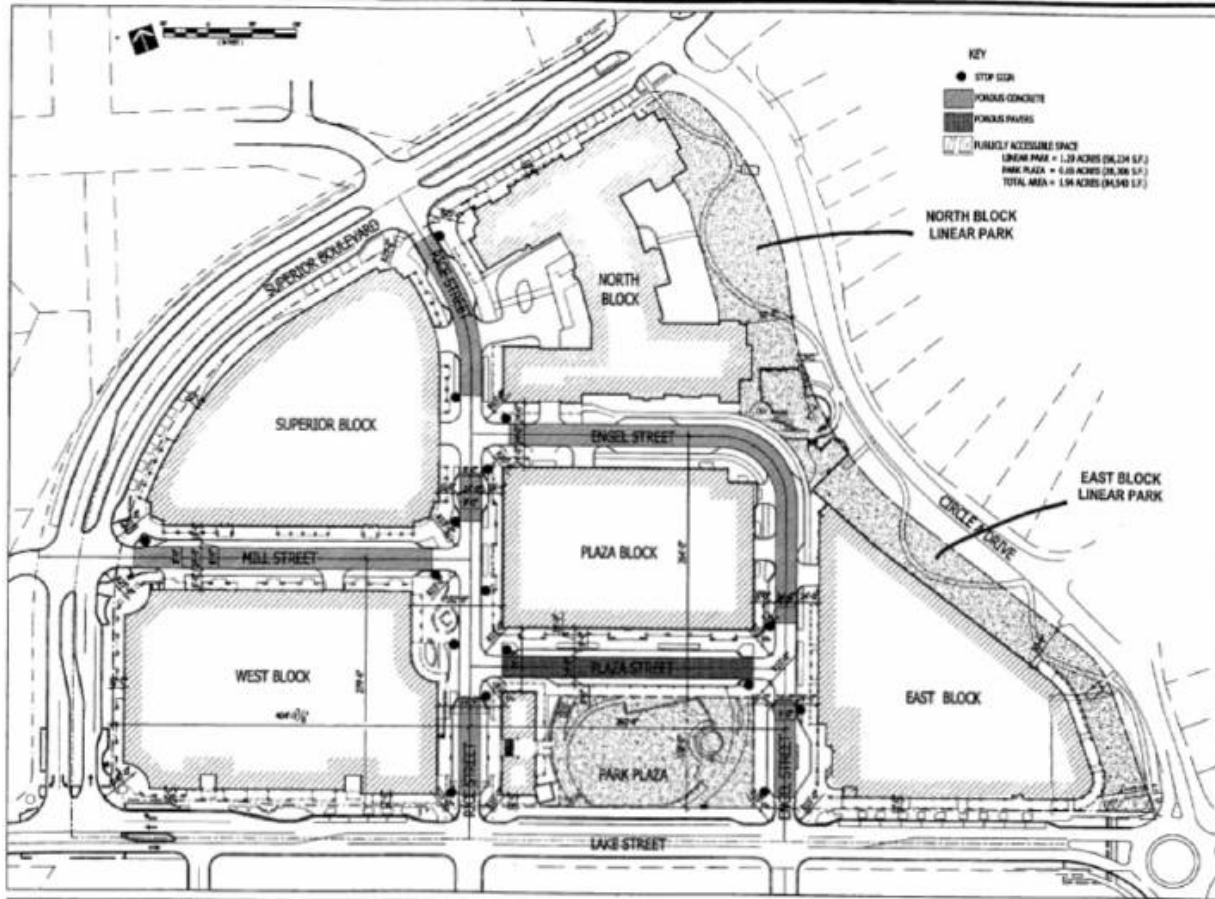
EXHIBIT B MINIMUM IMPROVEMENTS SITE PLAN
